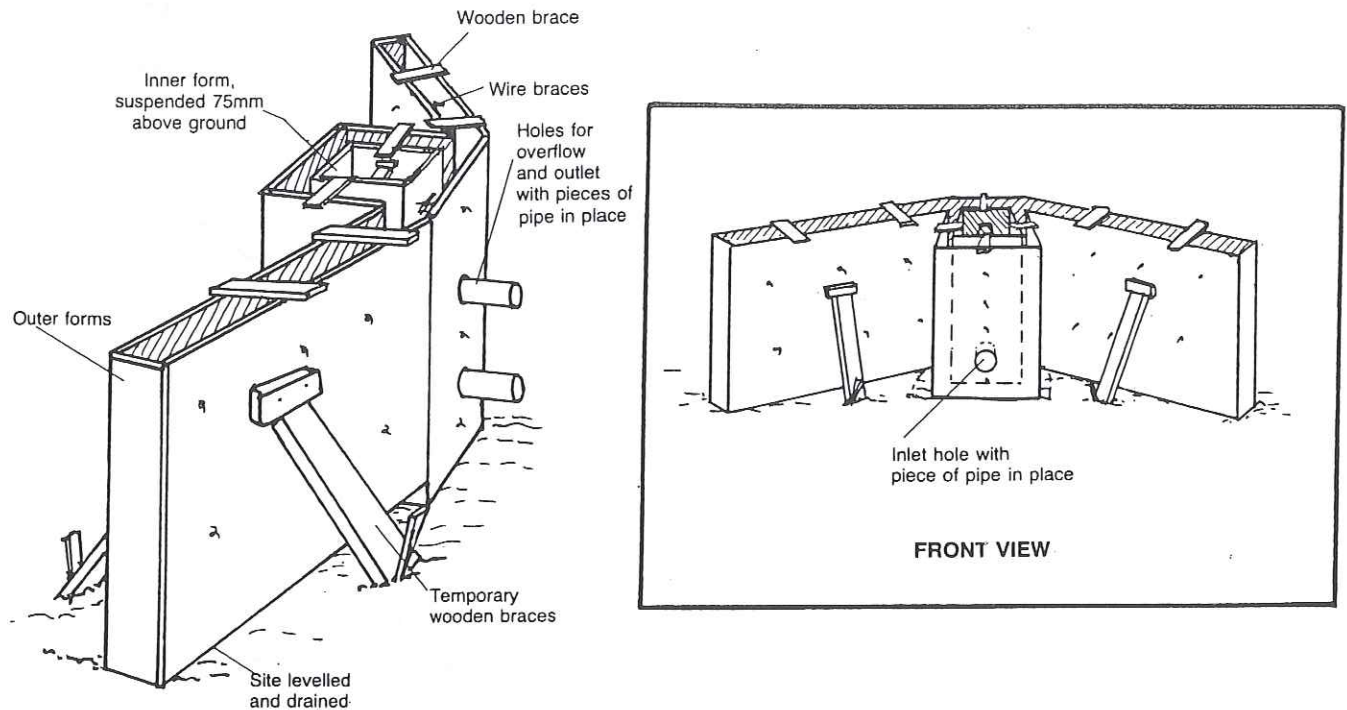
Forms for Anti-Seepage Wall and Collection Box
